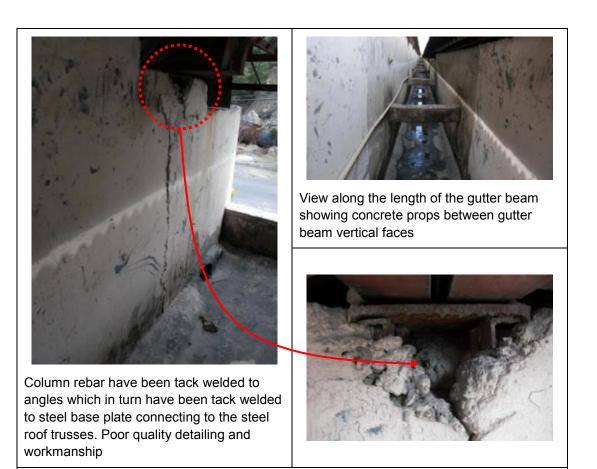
Gutter beam details and typical roof truss to concrete connection (taken from either warehouse B2 or B3 due to easier access at those locations.
